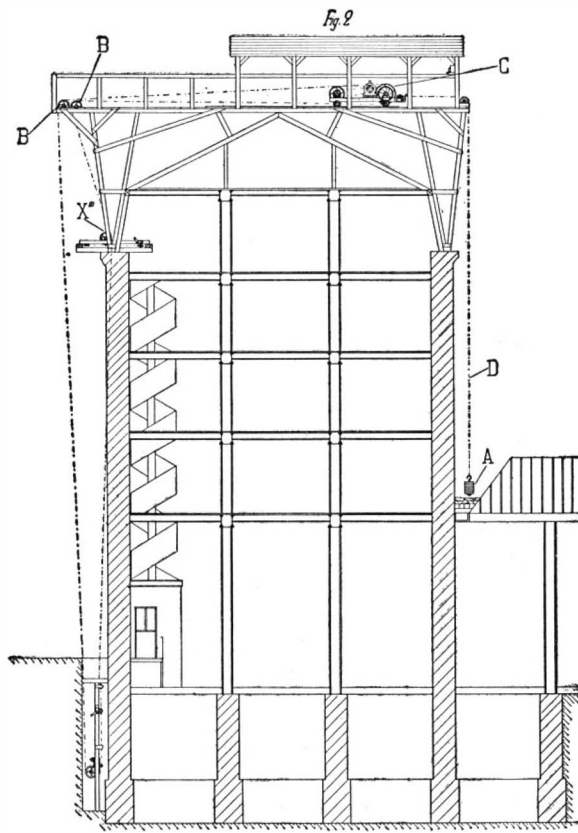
Diagram of Building, Showing the Cable Arranged for Sawing the Façade.
